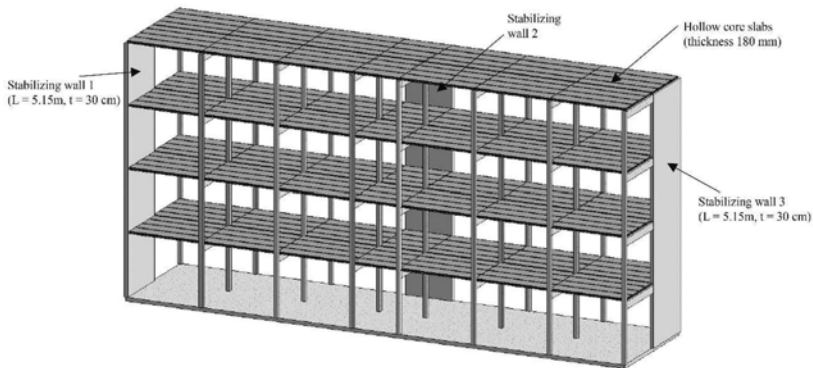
3D view of the structural system of a precast concrete building with a maximum storey height of 5 m.
